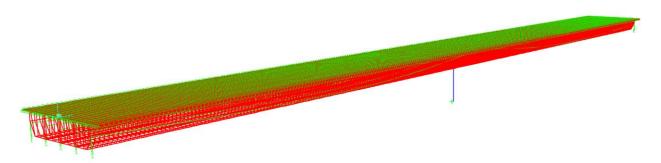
Model of a two-span PTBG bridge with a thin layer of UHPC added to the deck.
